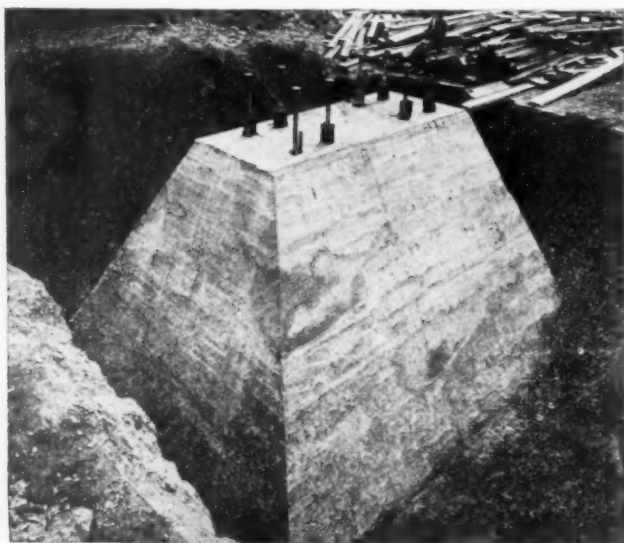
TYPICAL COLUMN FOOTING FOR ROW F, FORGE AND FURNACE BUILDING, AUGUST 29, 1919
